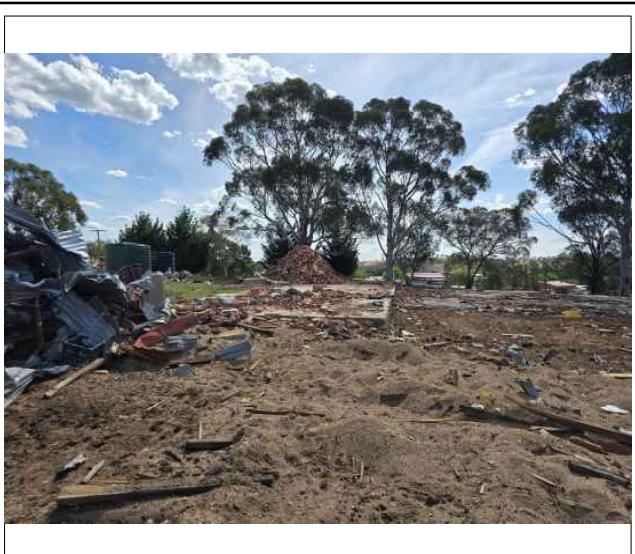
Footprint of demolished Shed 3 looking east with remnant slab in foreground.
